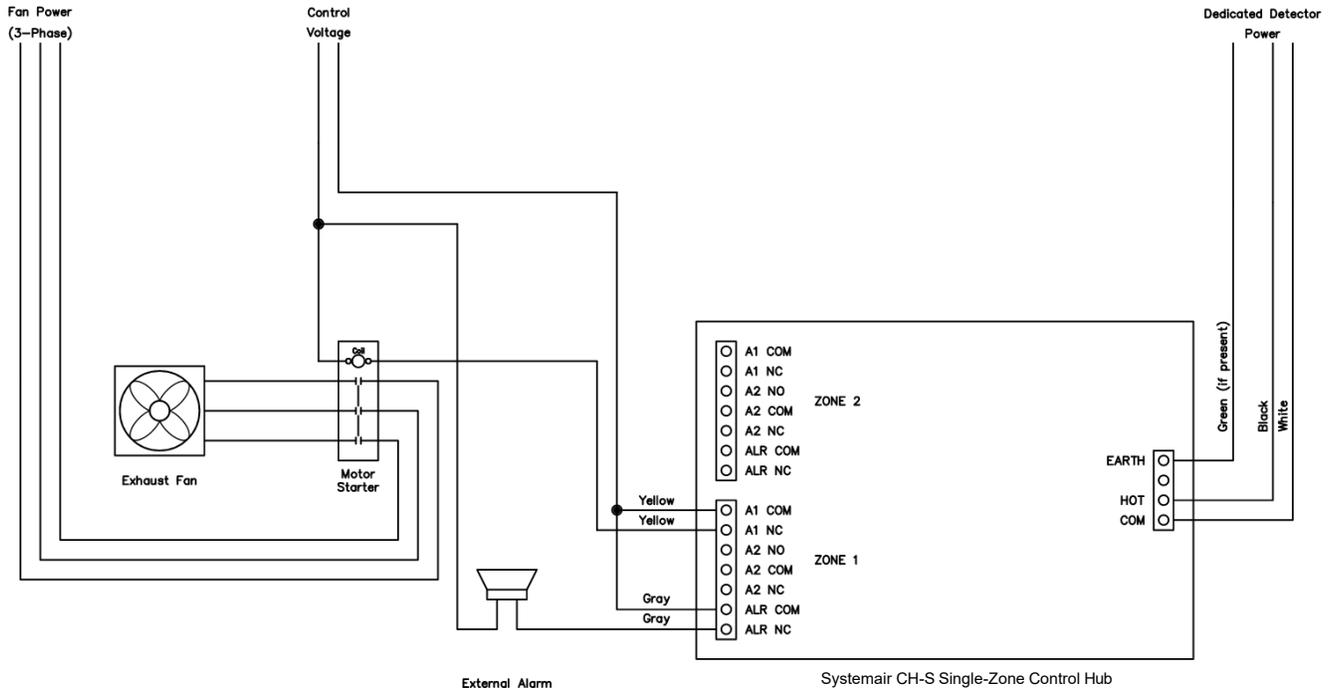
Wiring - Single Fan Ventilation System with One Zone
